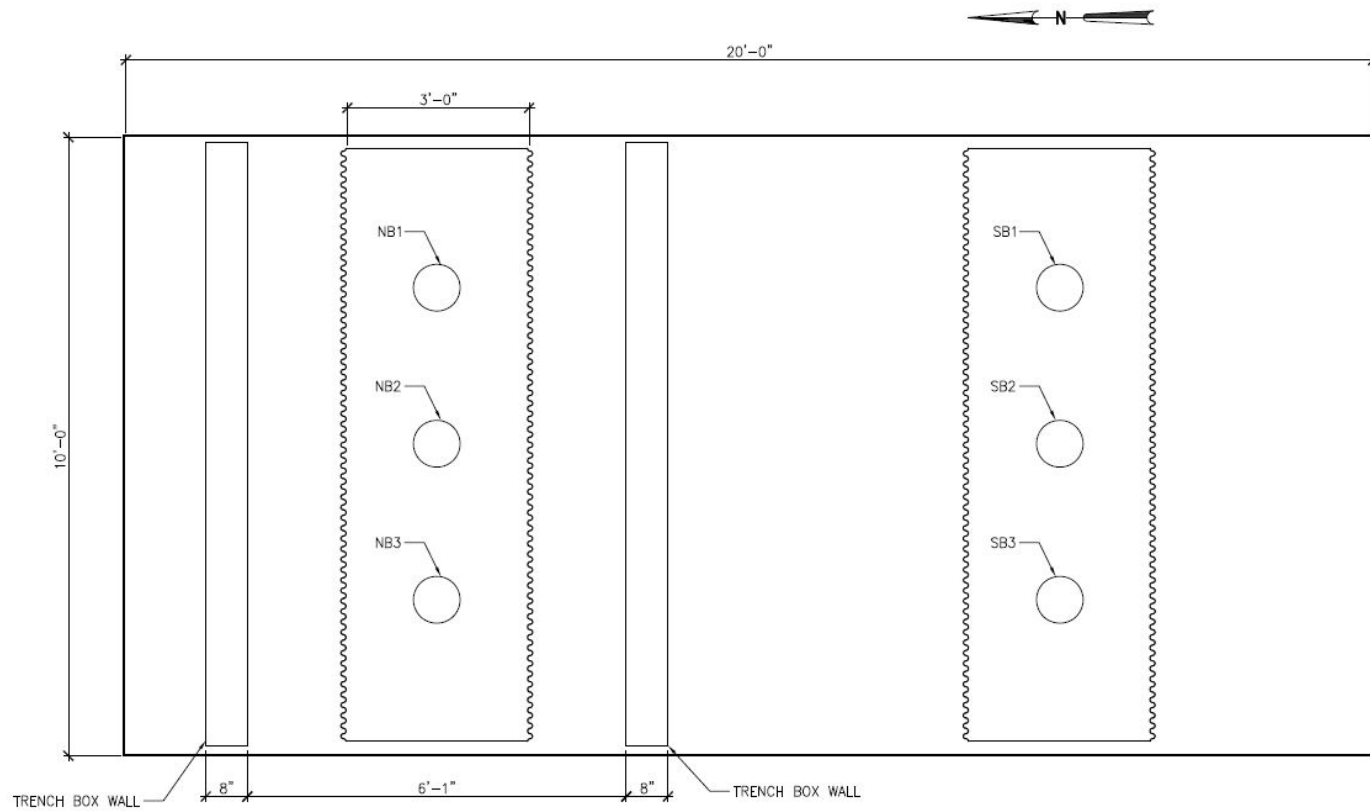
Earth pressure cell layout through Section E-E for Trench Box Test Two
